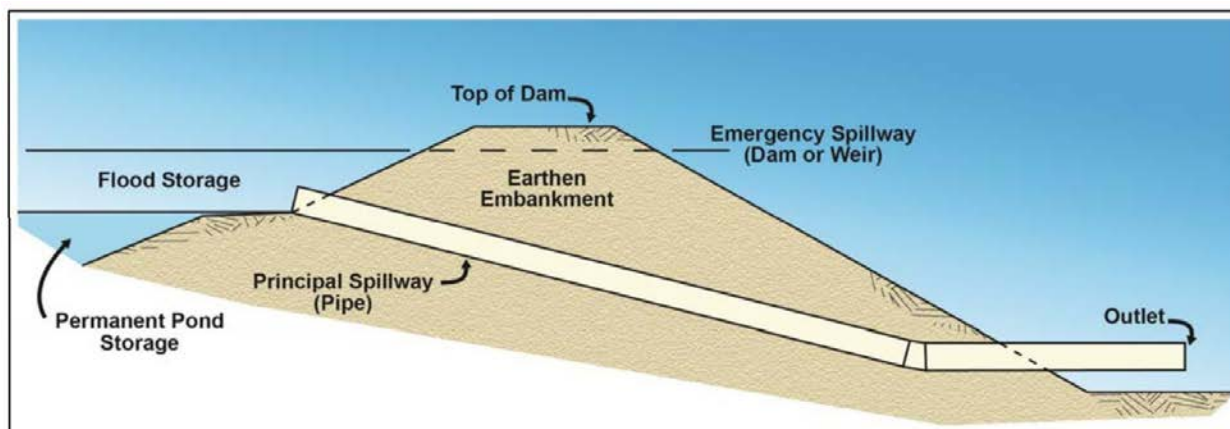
Schematic of a pond constructed to provide flood storage.
